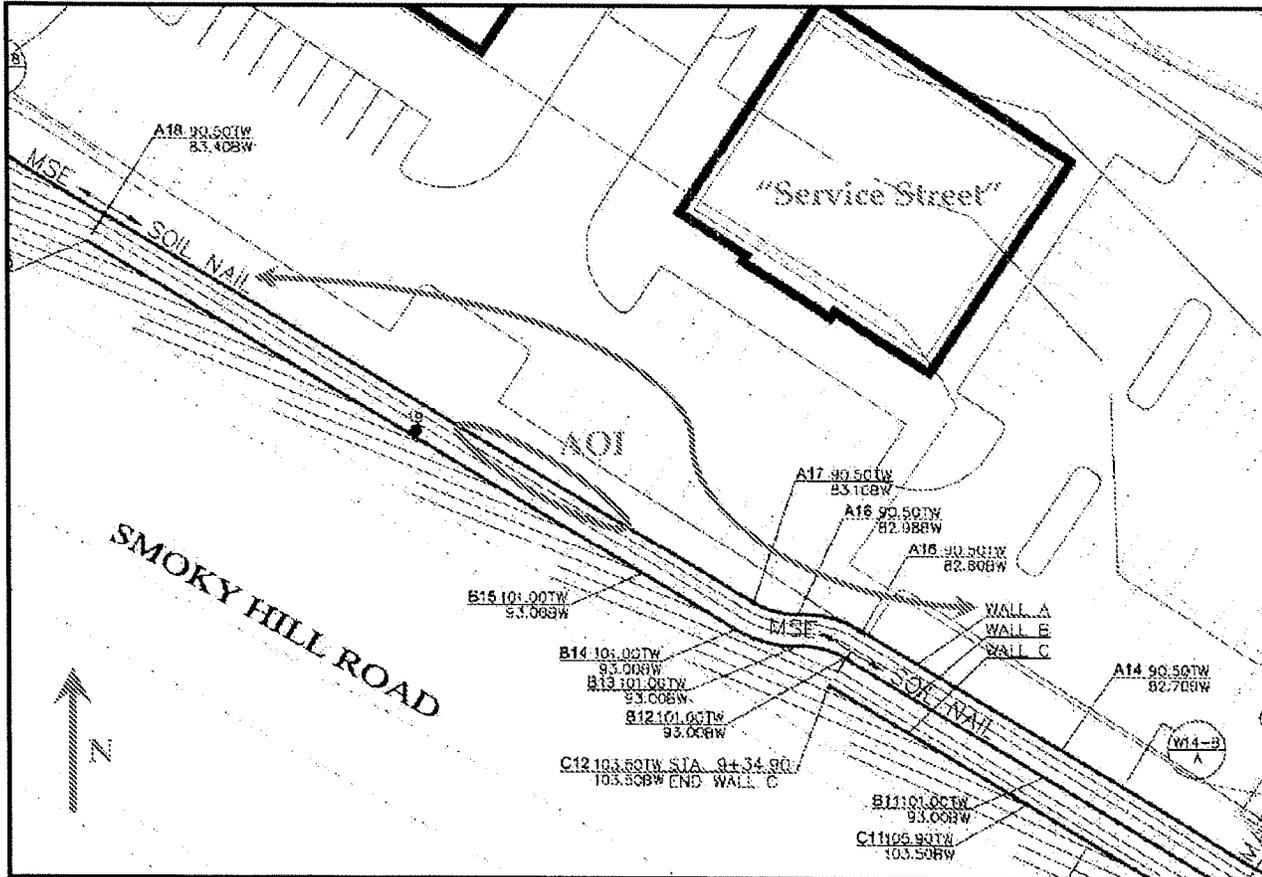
Excerpt from sheet W14-3 of Ground Engineering drawings showing area of interest; notated by Golden Forensics; note Wall A is a soil nail wall at AOI
